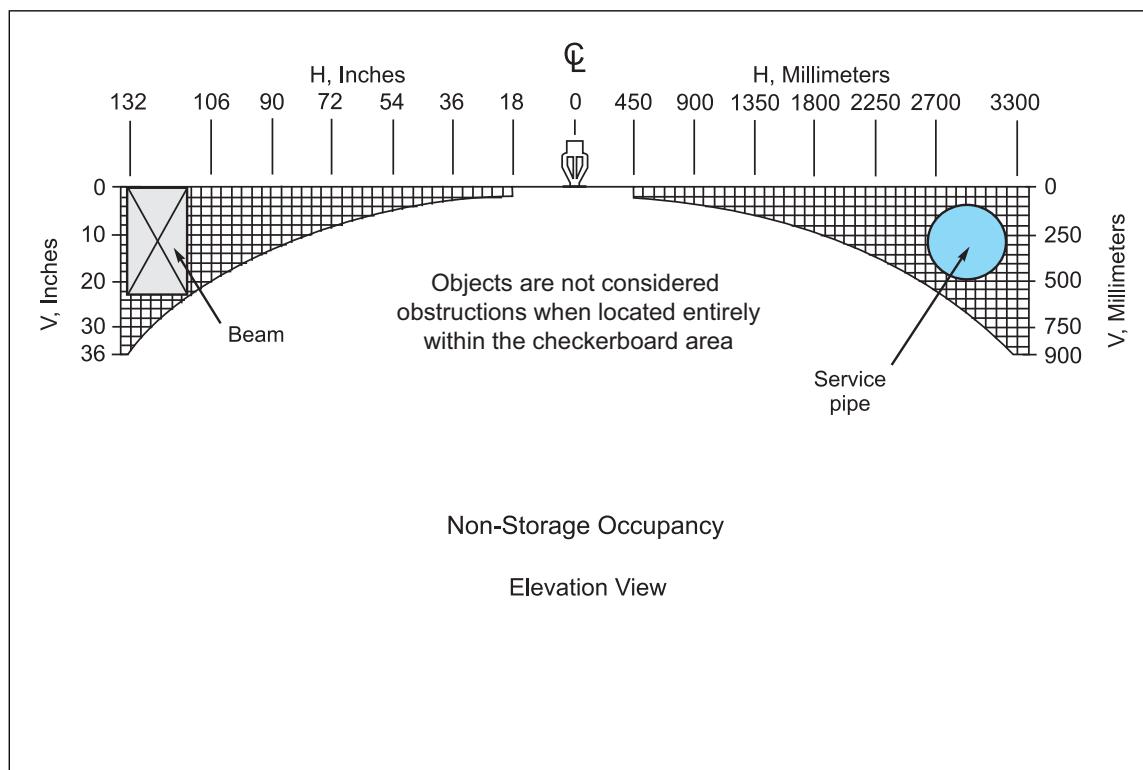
(b). Objects near ceiling level not considered obstructions to extended-coverage Nonstorage pendent and upright sprinklers
